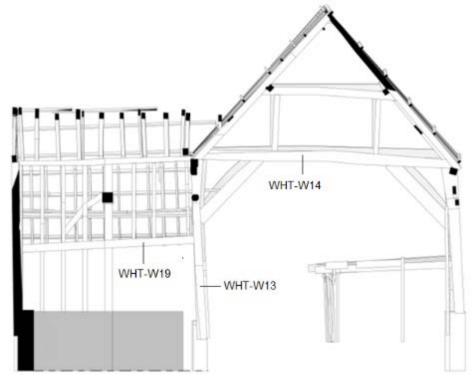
Section through Truss 4, east face, showing the sampled timbers, WHT-W13-14, and WHT-W19 (after ATD London Ltd)
